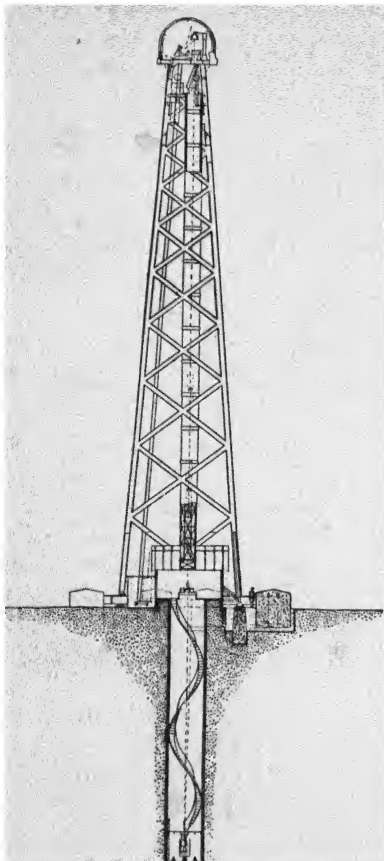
Structural Plan of the 150-Foot Tower Telescope of the Mt. Wilson Solar Observatory
